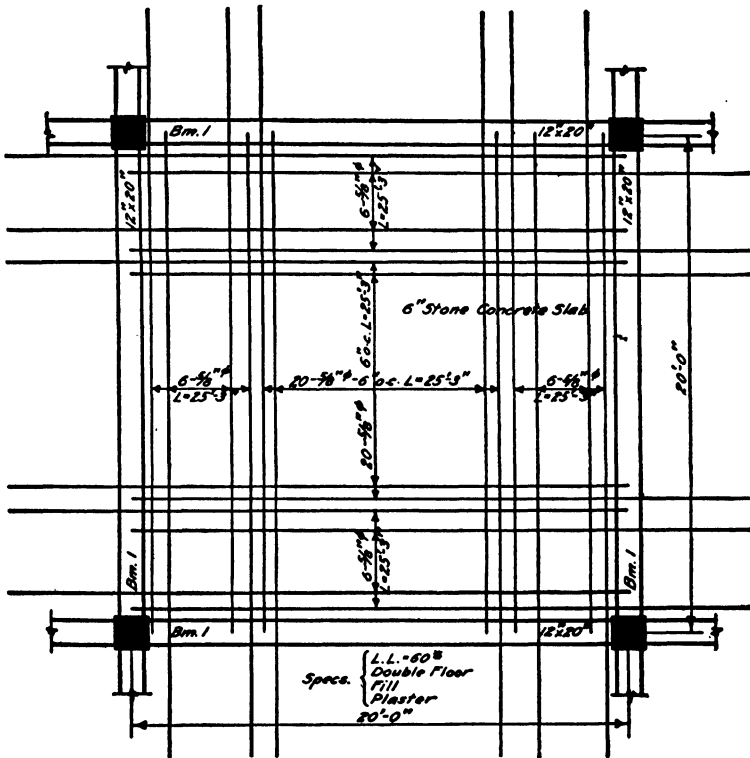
Framing for Two-Way Stone Concrete Slab in Concrete Frame.
